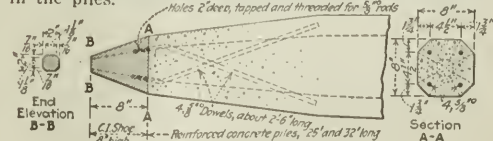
DETAILS OF SHOE FOR CONCRETE PILE
